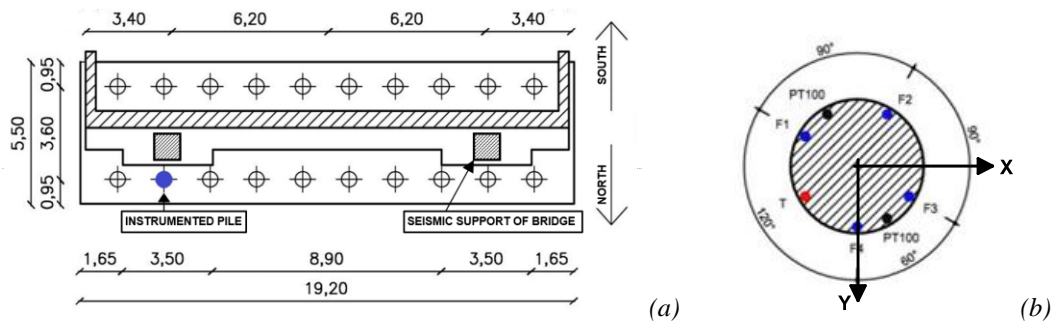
Plant of the North abutment (a) and transversal section of the instrumented CFA pile (b).
